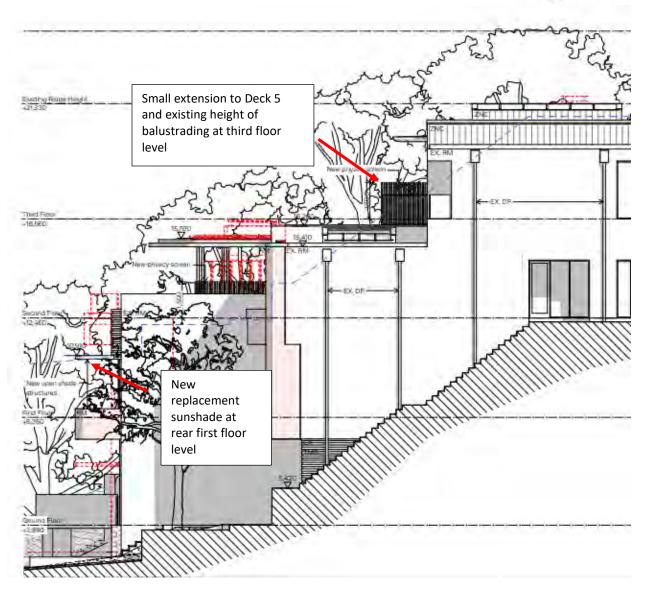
Excerpt from South Elevation (Architectural Drawing 202 – South Elevation)
